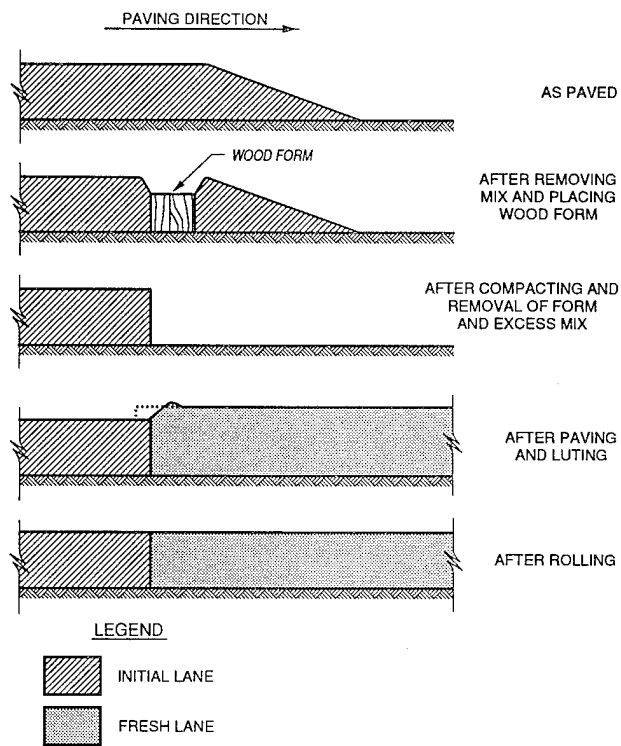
TRANSVERSE JOINT FORM AND REMOVE CONSTRUCTION
